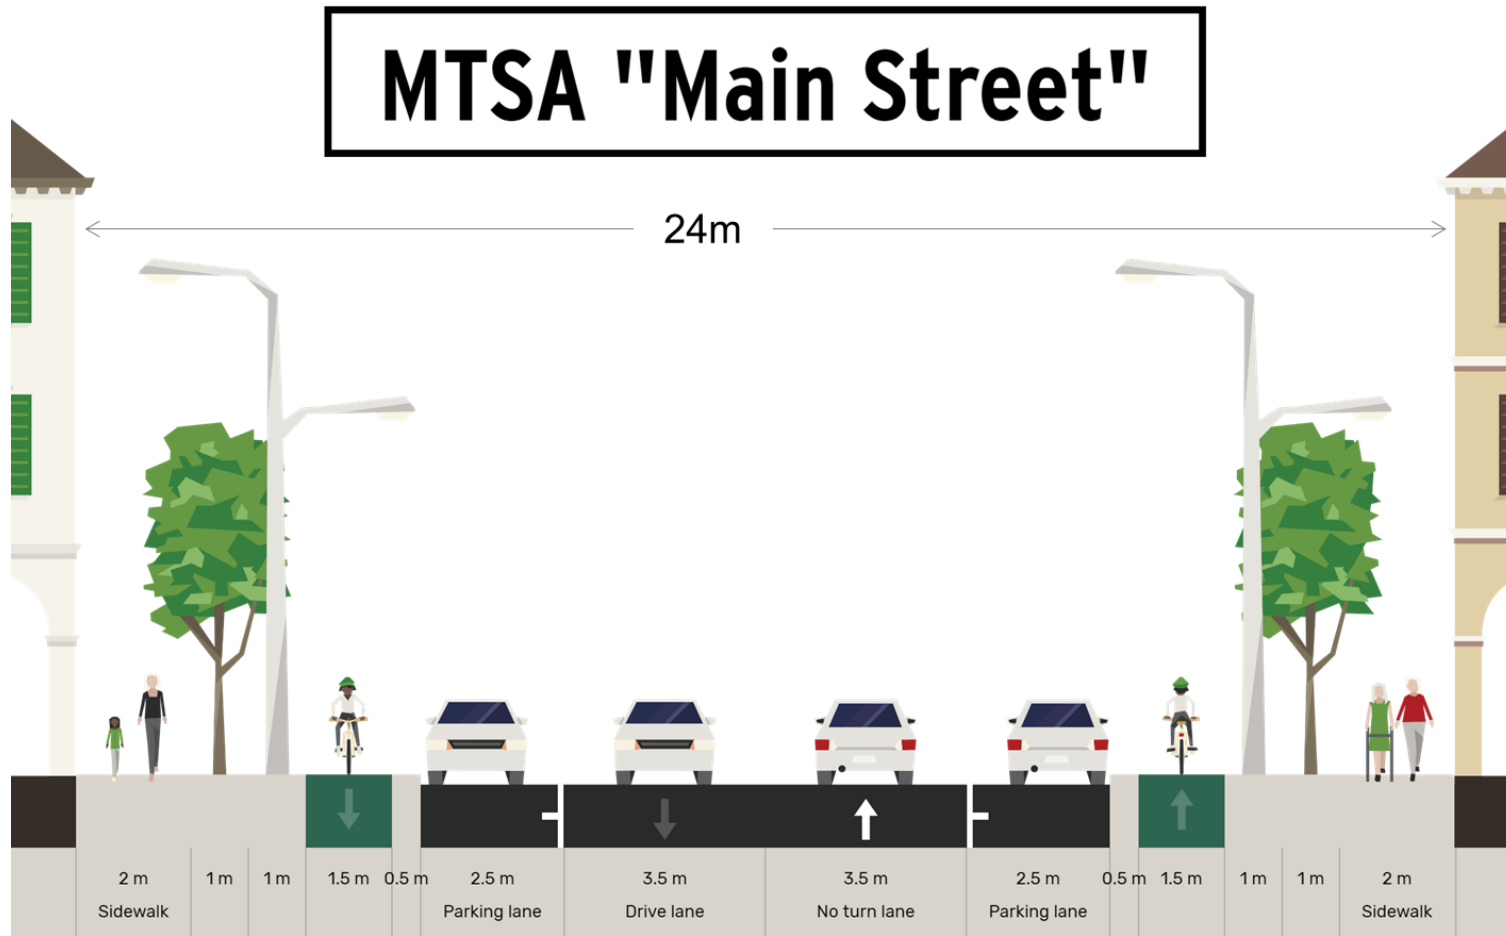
Conceptual Typical Cross Section for MTSA "Main Street" Collector Road
